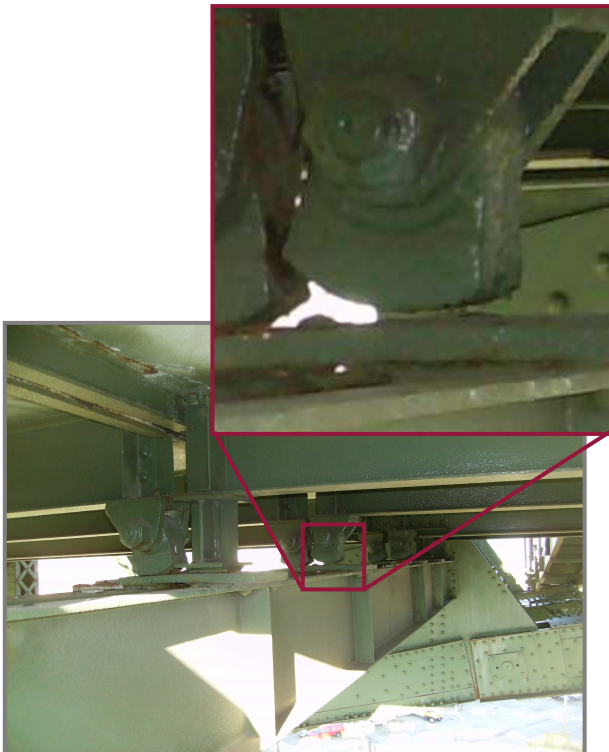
Gap between Stringer 3 rocker bearing and bearing plate at FB 35.
